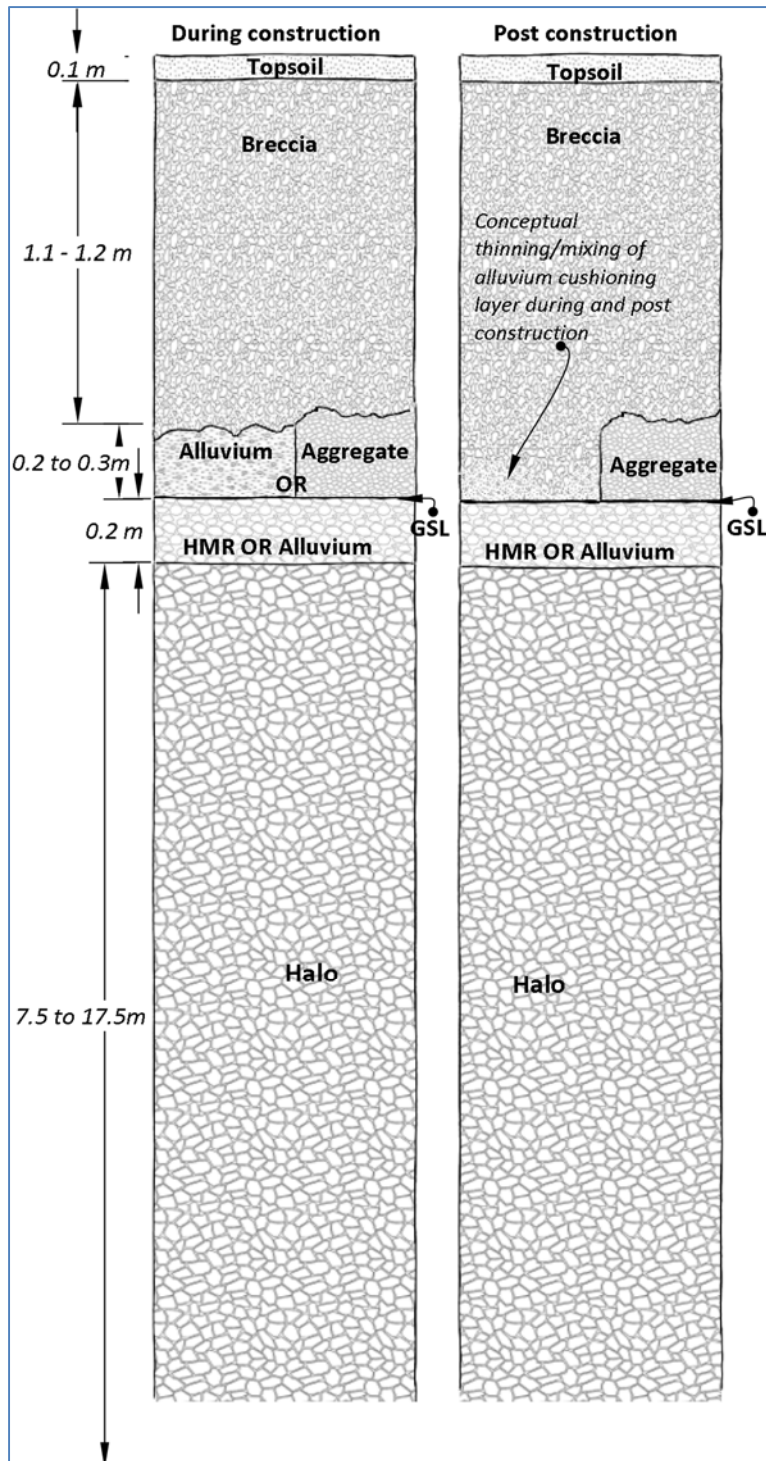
Cover system design options for slopes, with the sketch on the left representing the construction layout and the sketch on the right representing a final or long-term construction.
